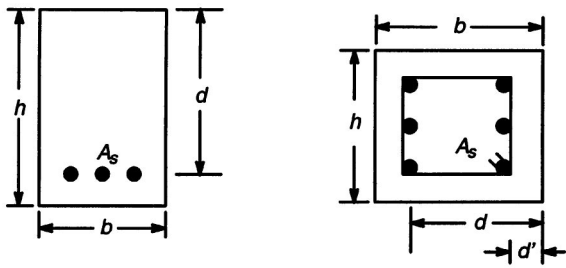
Typical geometry of reinforced concrete beam and column sections
